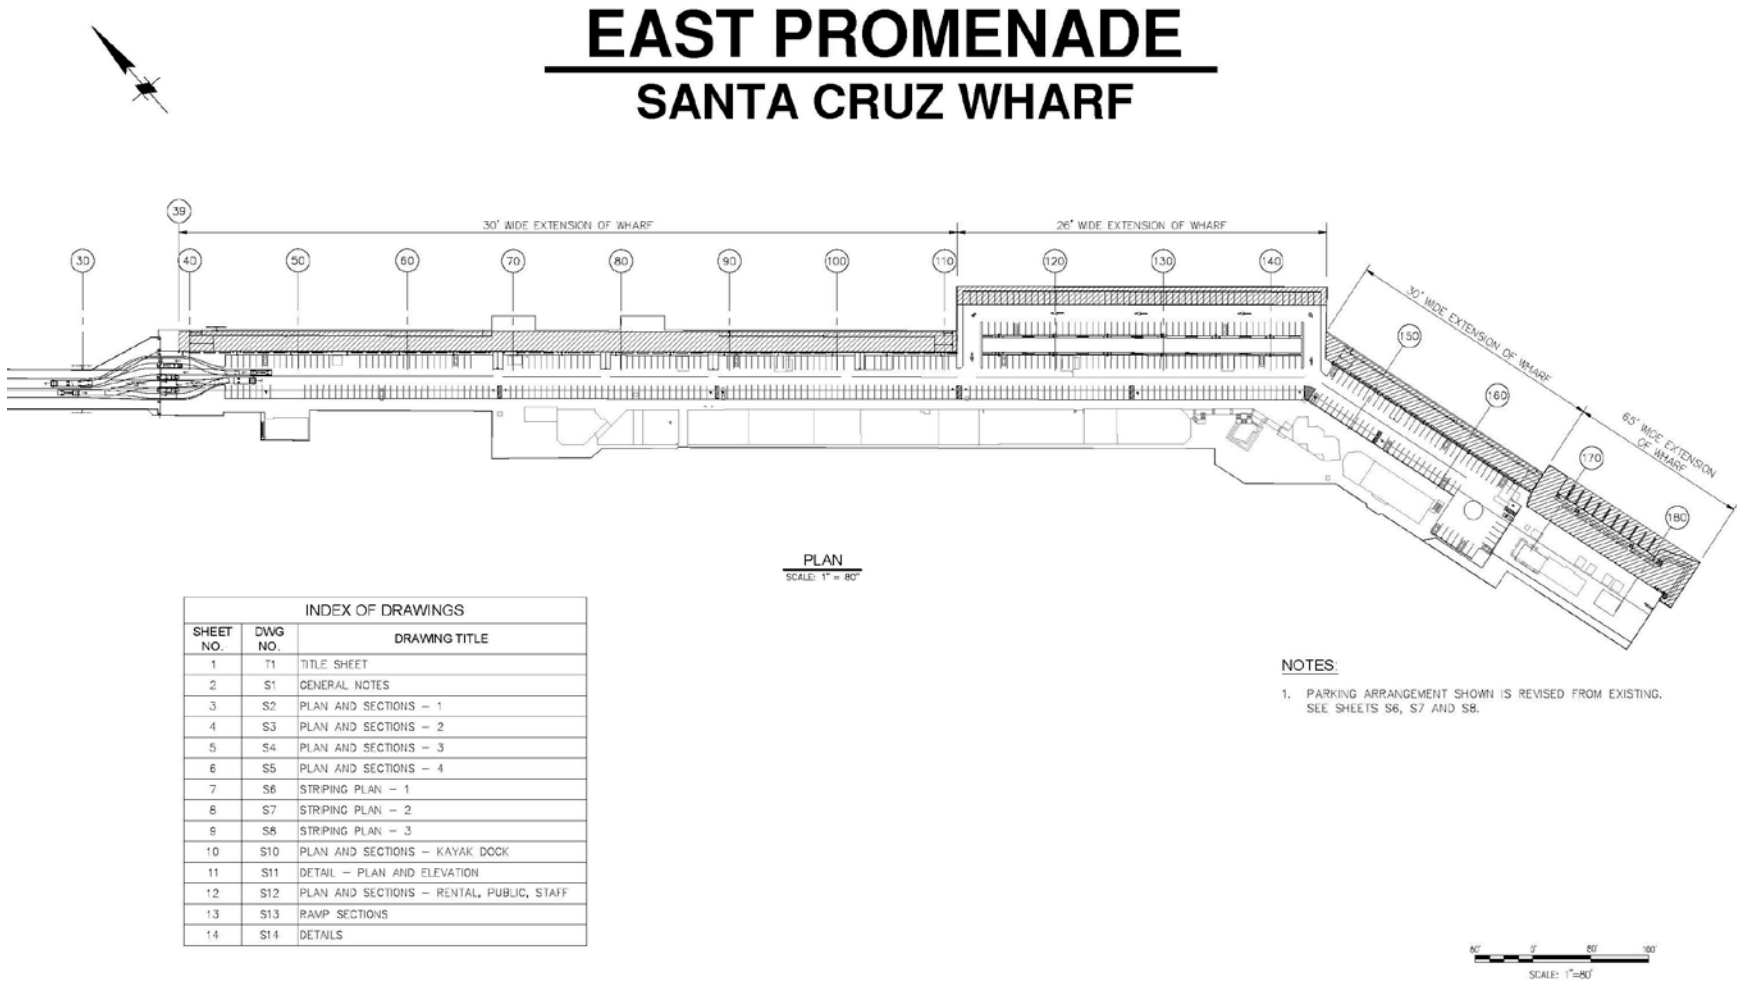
B: East Promenade Representative Site Plan & Cross Section
